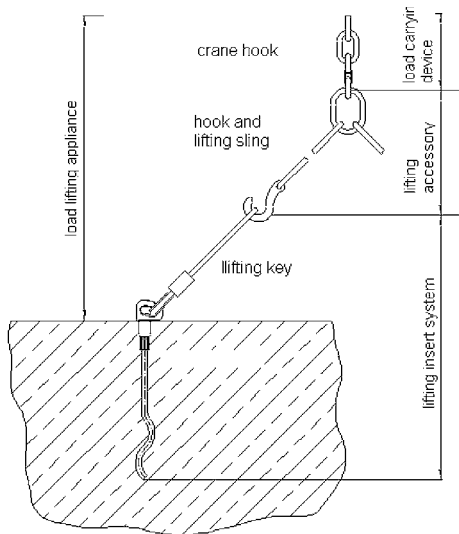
Definitions: lifting socket, lifting accessory and lifting tackle
